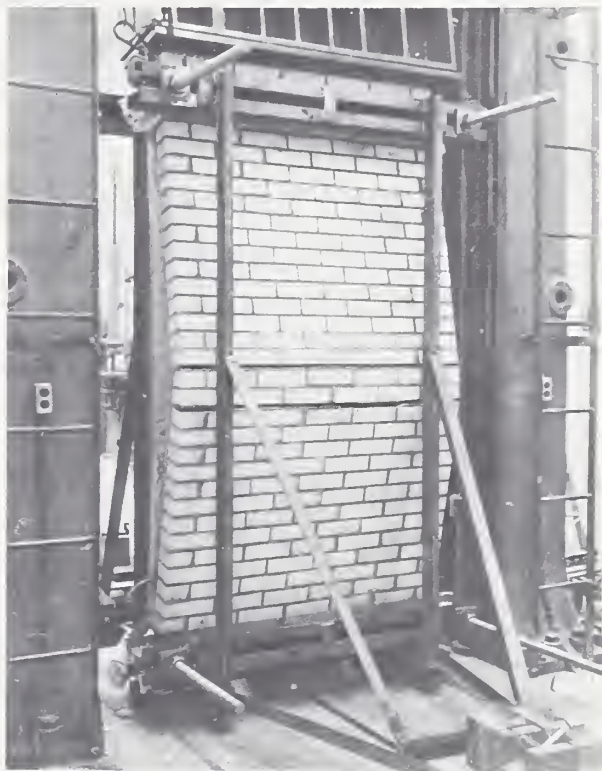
Combined compressive and uniform transverse load test on a 4 x 8 ft masonry wall. The uniform transverse load was applied by means of an air bag attached to the steel reaction frame on the opposite face of the wall.
